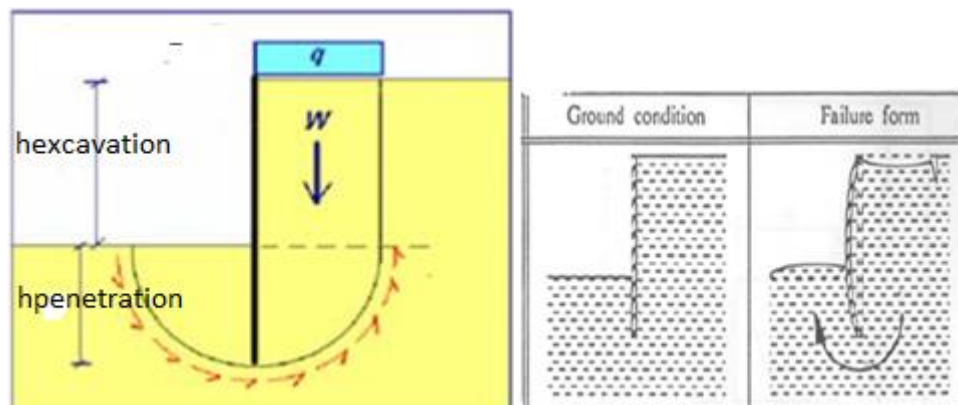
Schematic Basel heaves (retaining wall without probe) [4]
